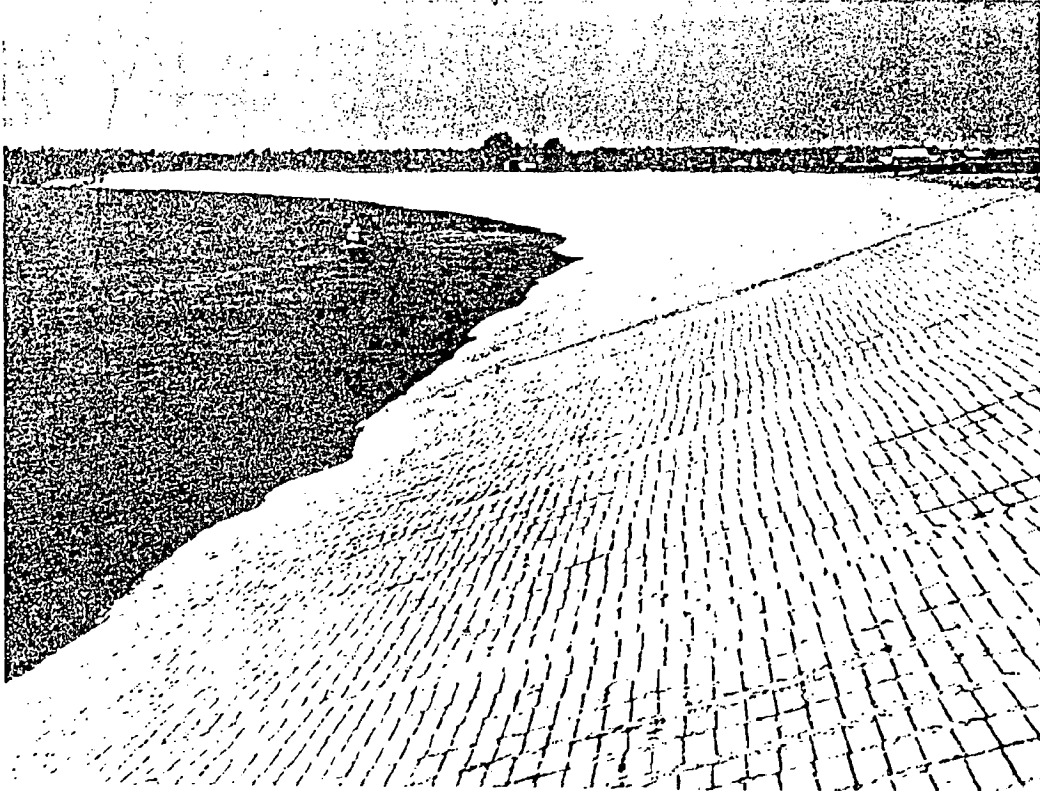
Bank protected with articulated concrete mattress, Lower Mississippi River. (Source: U.S. Army, Corps of Engineers, Vicksburg District.)
